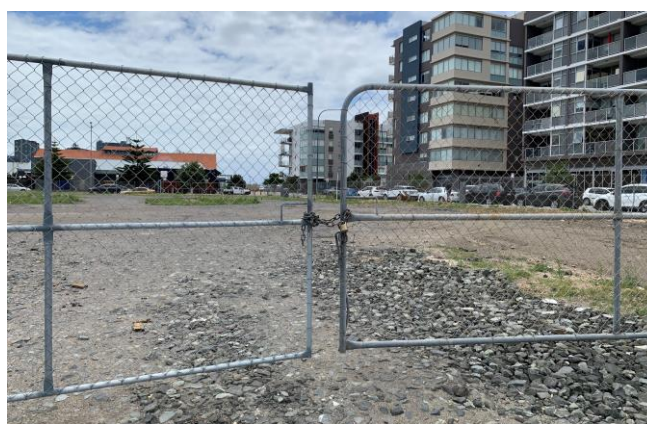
Site entrance viewed looking north towards Honeysuckle Drive
